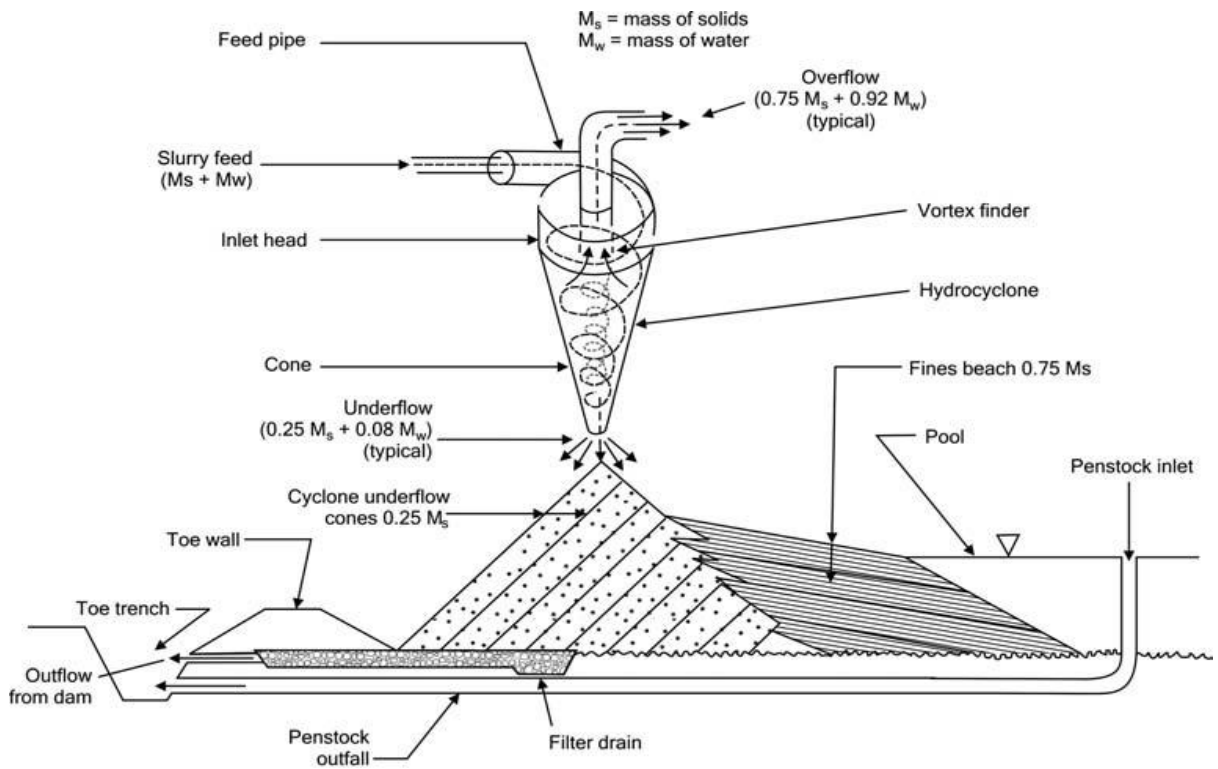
Dam construction using on-wall cycloning (Blight, 2010)
